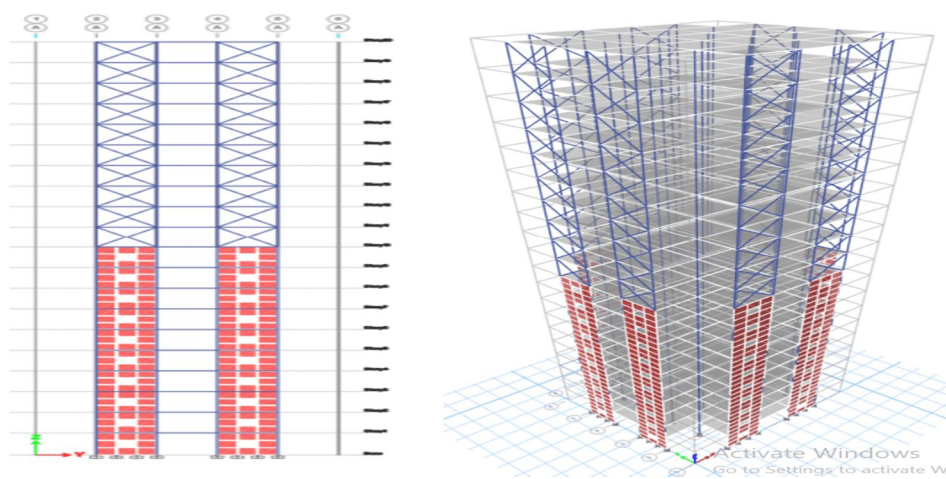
Elevation and 3D view of Irregular building with shear wall & bracings combination at each corner
